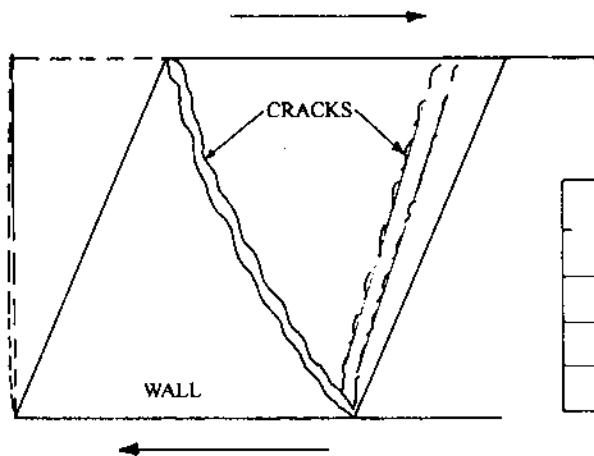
Diagonal shear cracks in masonry
